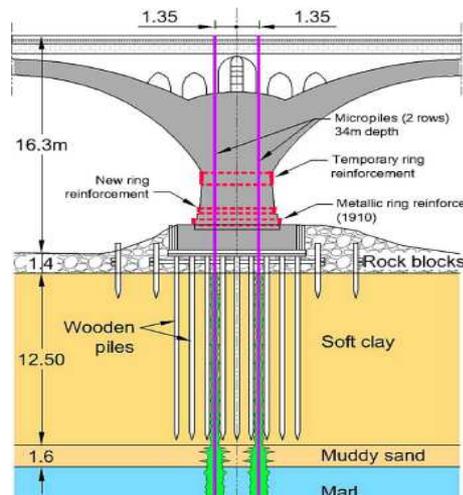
Vertical section of Pierre Bridge in Bordeaux (Frank, 2006)
